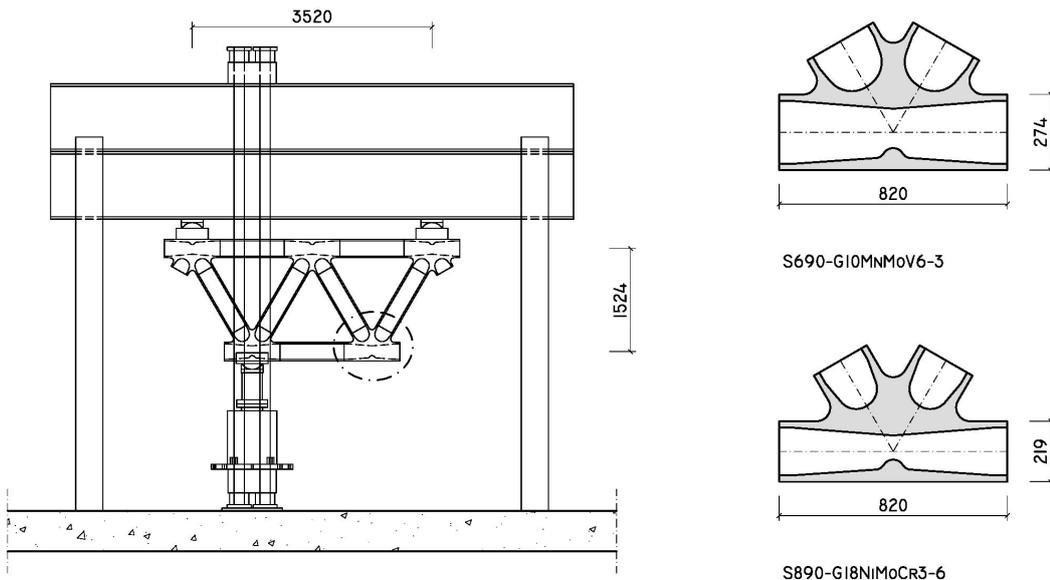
Conceptual drawing of large scale test setup for truss made of VHSS cast steel members and CHS.
